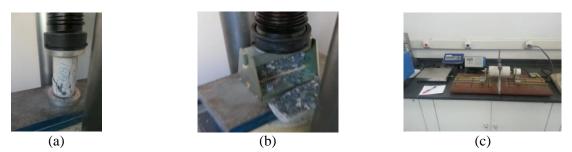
The mechanical testing of the cylindrical concrete specimens: (a) compression testing machine, (b) tension testing machine, (c) dynamic elasticity modulus testing machine.
